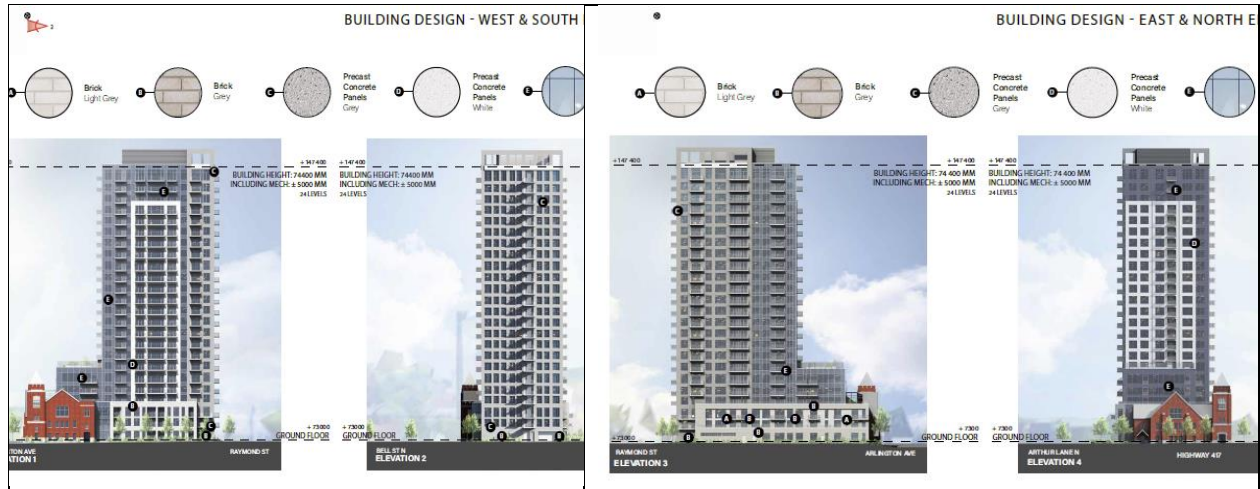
West, Southeast and North Elevations highlighting the selection of building materials. Source: Neuf 2024.
